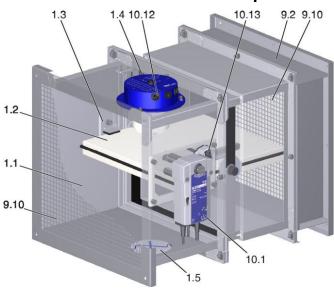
FK-EU with spring return actuator and duct smoke detector used as an air transfer damper
